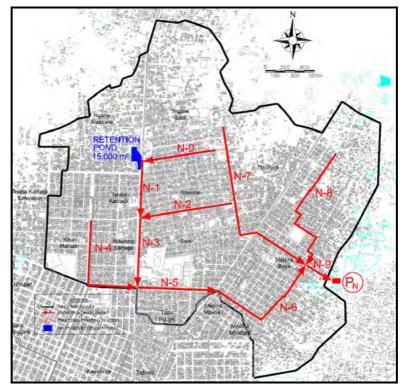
Location of Proposed Drainage Facilities in the North Drainage Area
